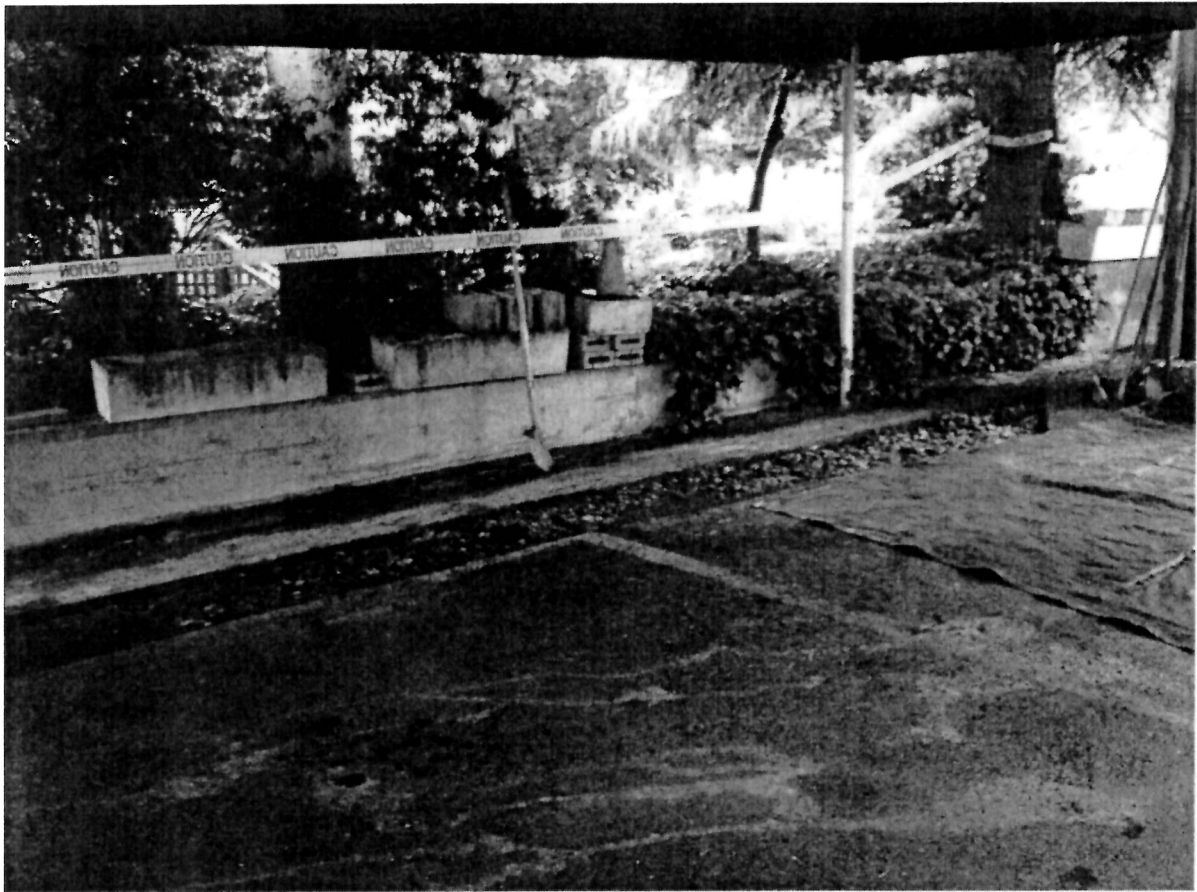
A 60cm wide trench, 90cm in depth, was excavated 60cm west of the retaining wall.
